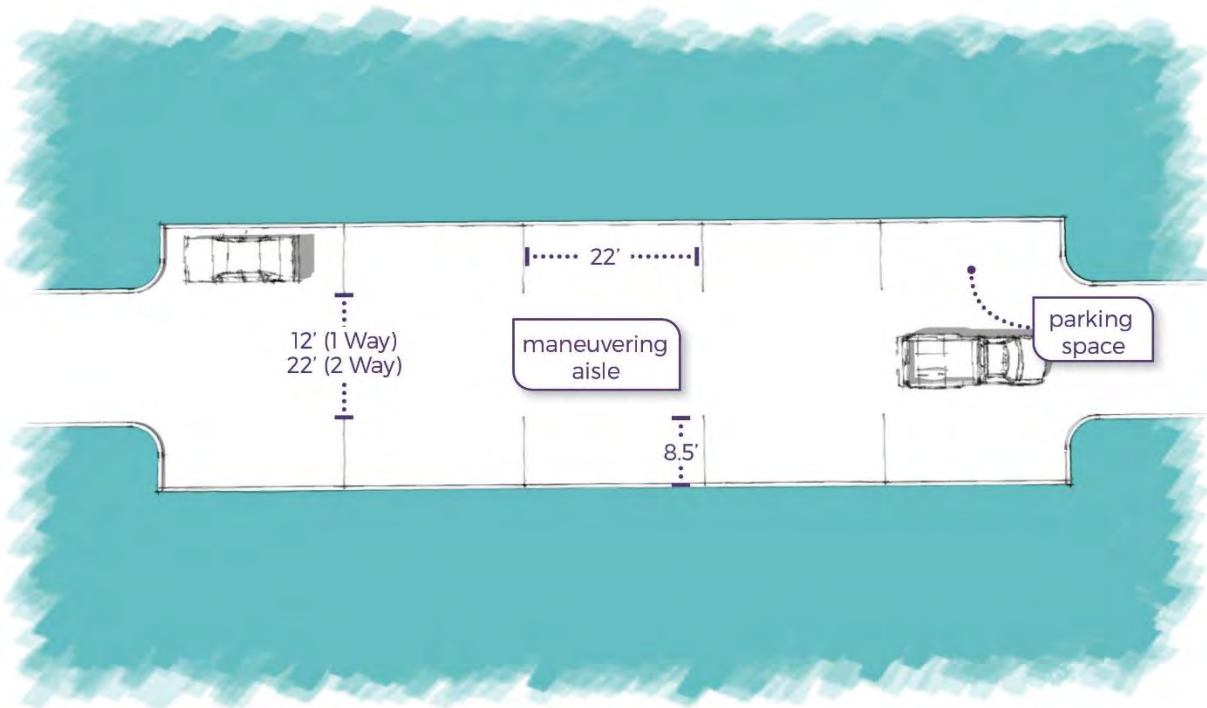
A. PARKING SPACE DIMENSIONS: 0 DEGREES (PARALLEL)
